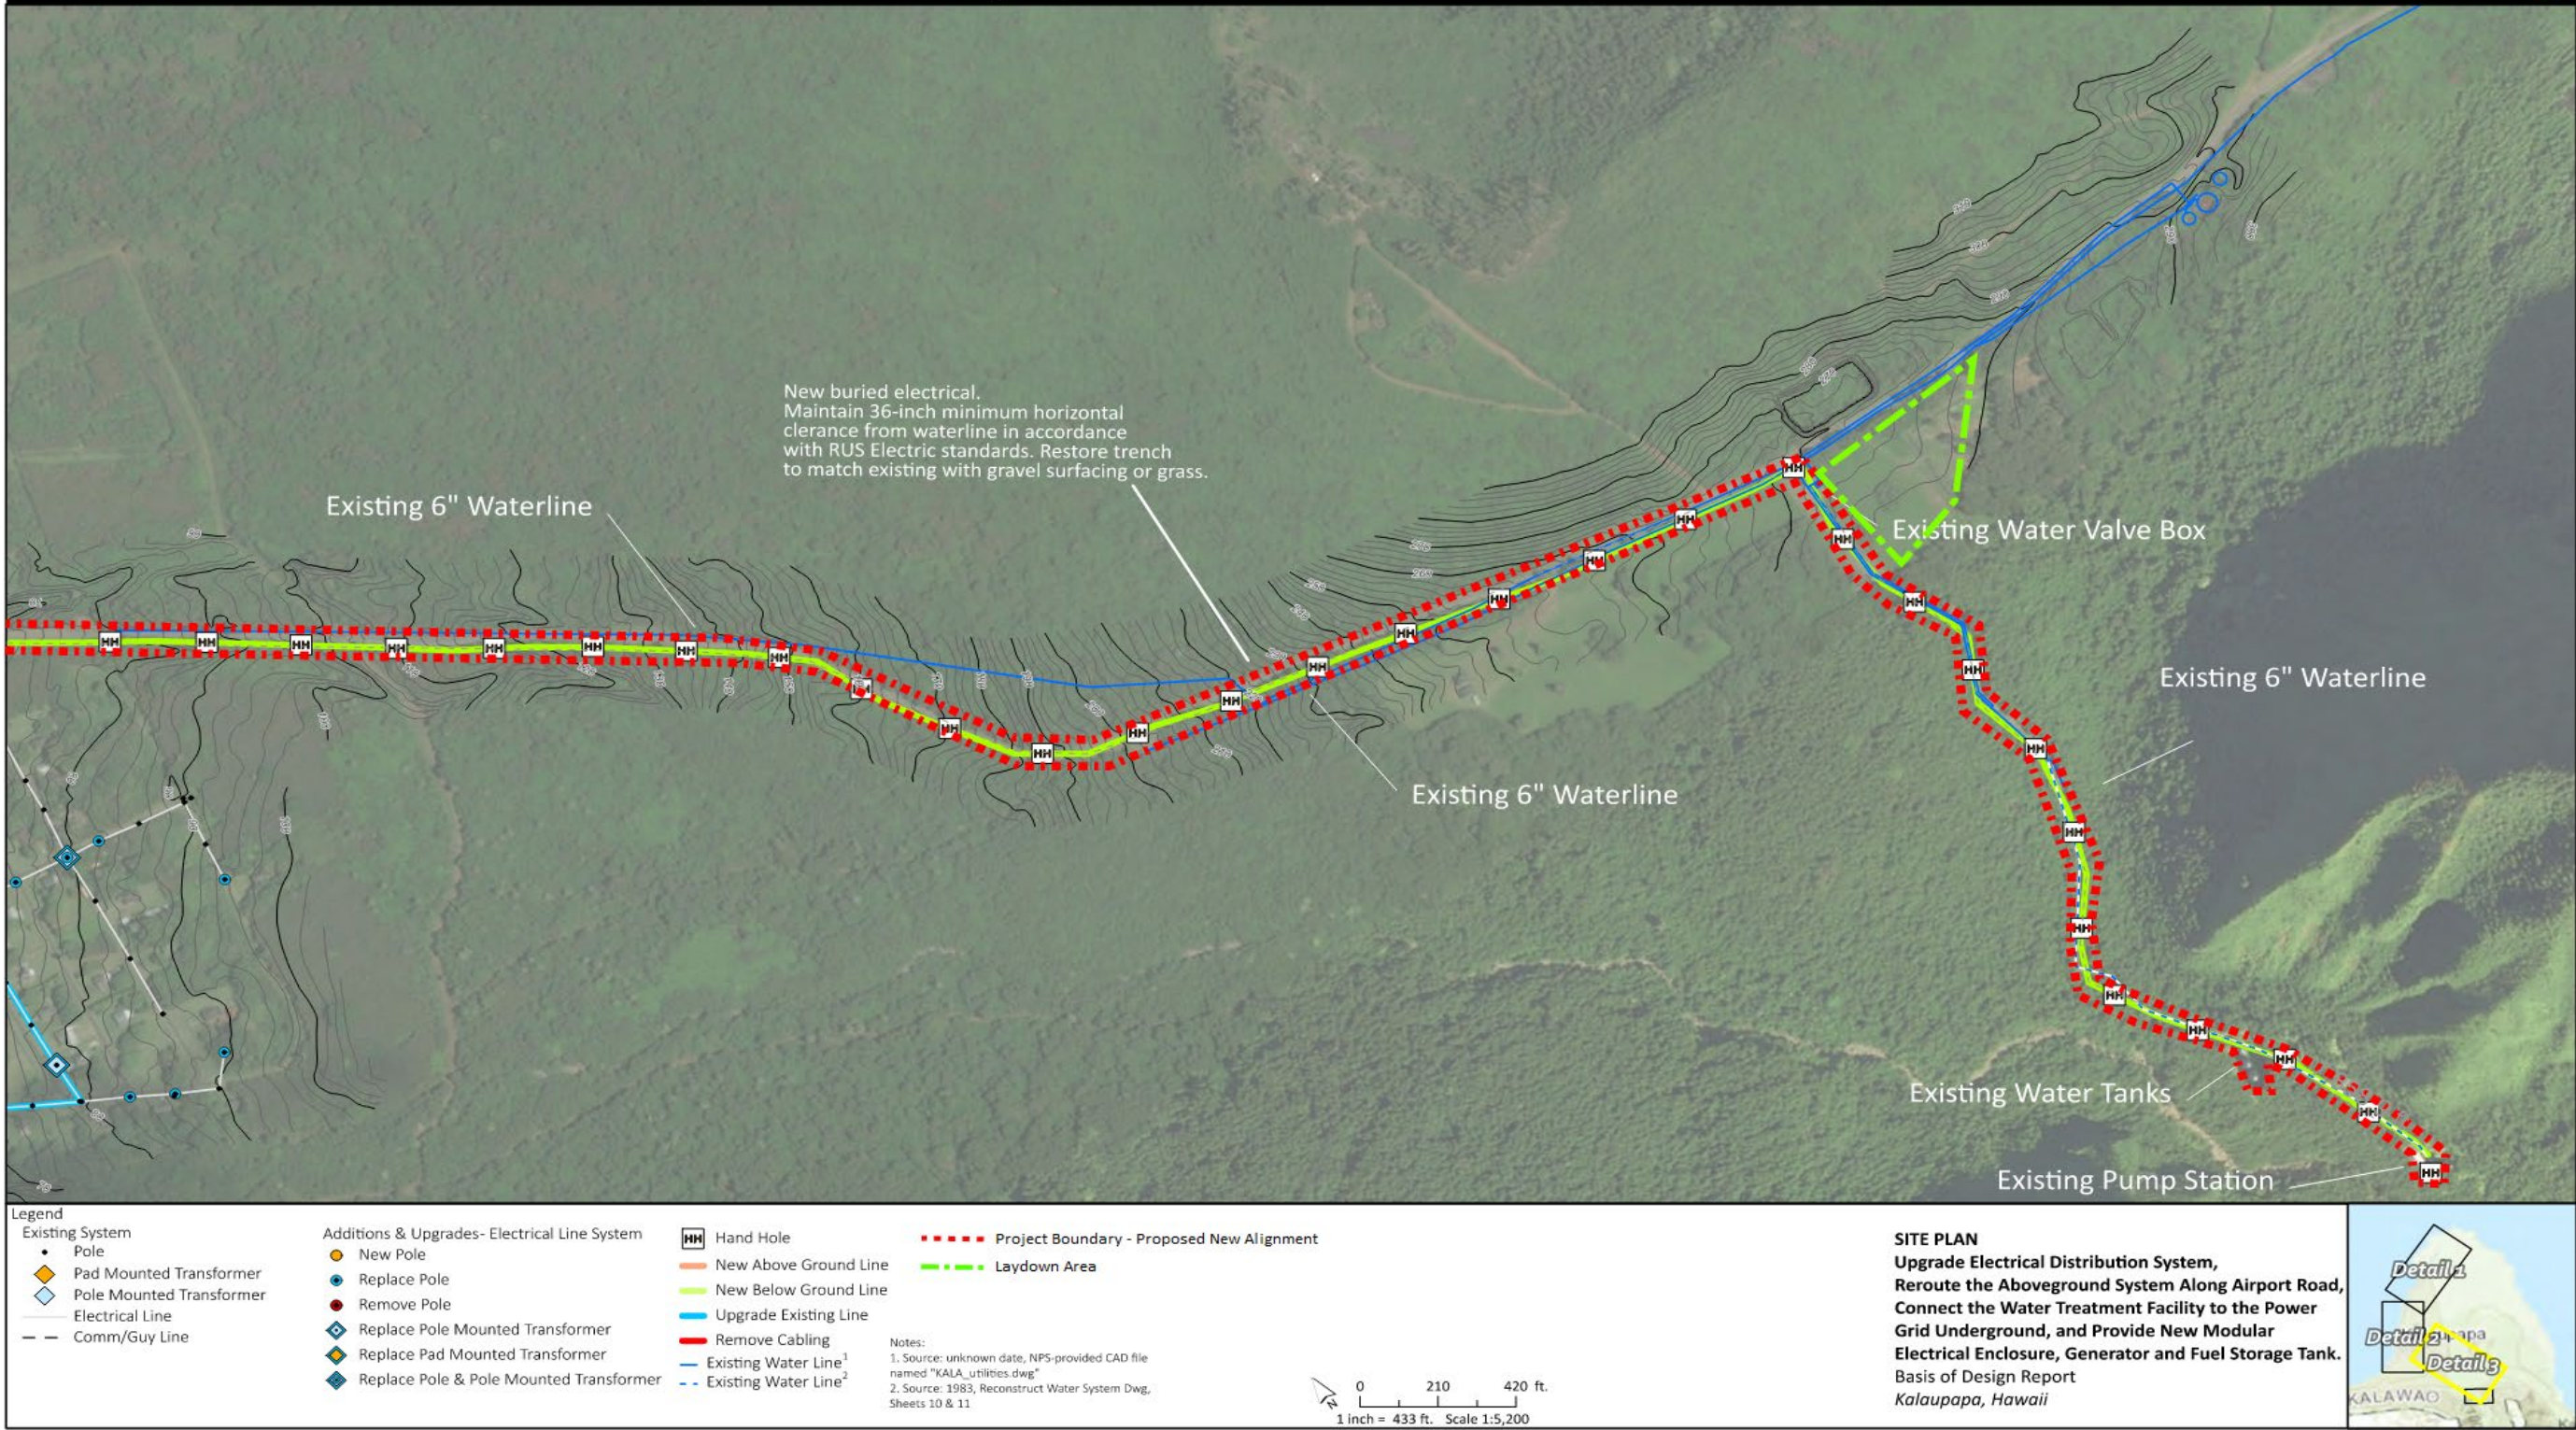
ALTERNATIVE 2 ALIGNMENT TO EXISTING WATER PUMP STATION
